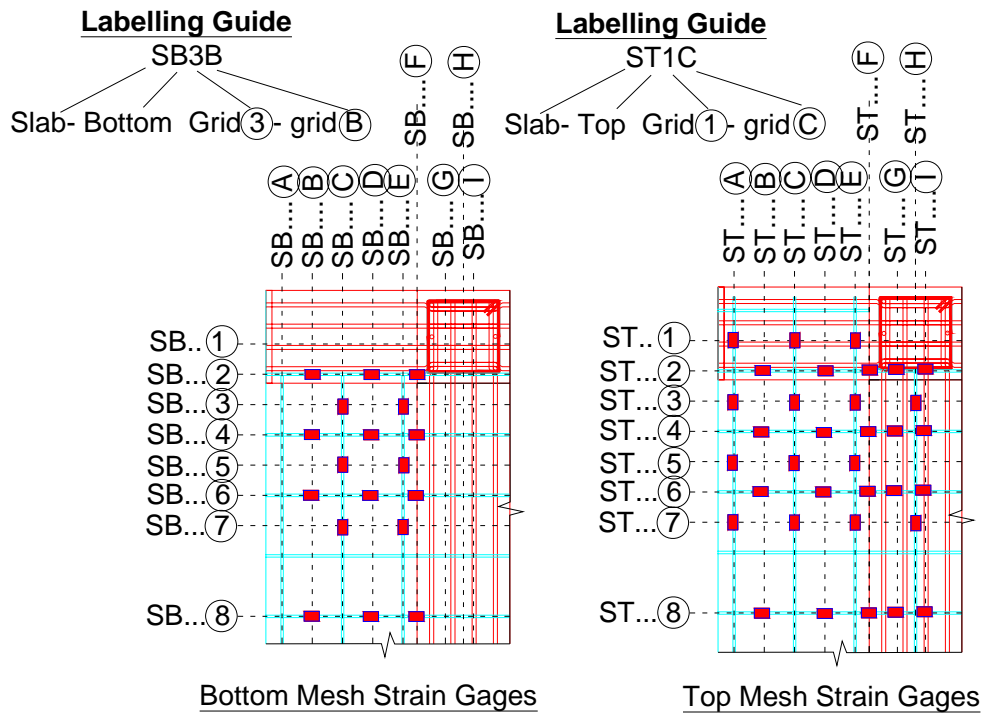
Strain Gages Plan and labelling guide for SL-O1 and SL-R3 Slab.
